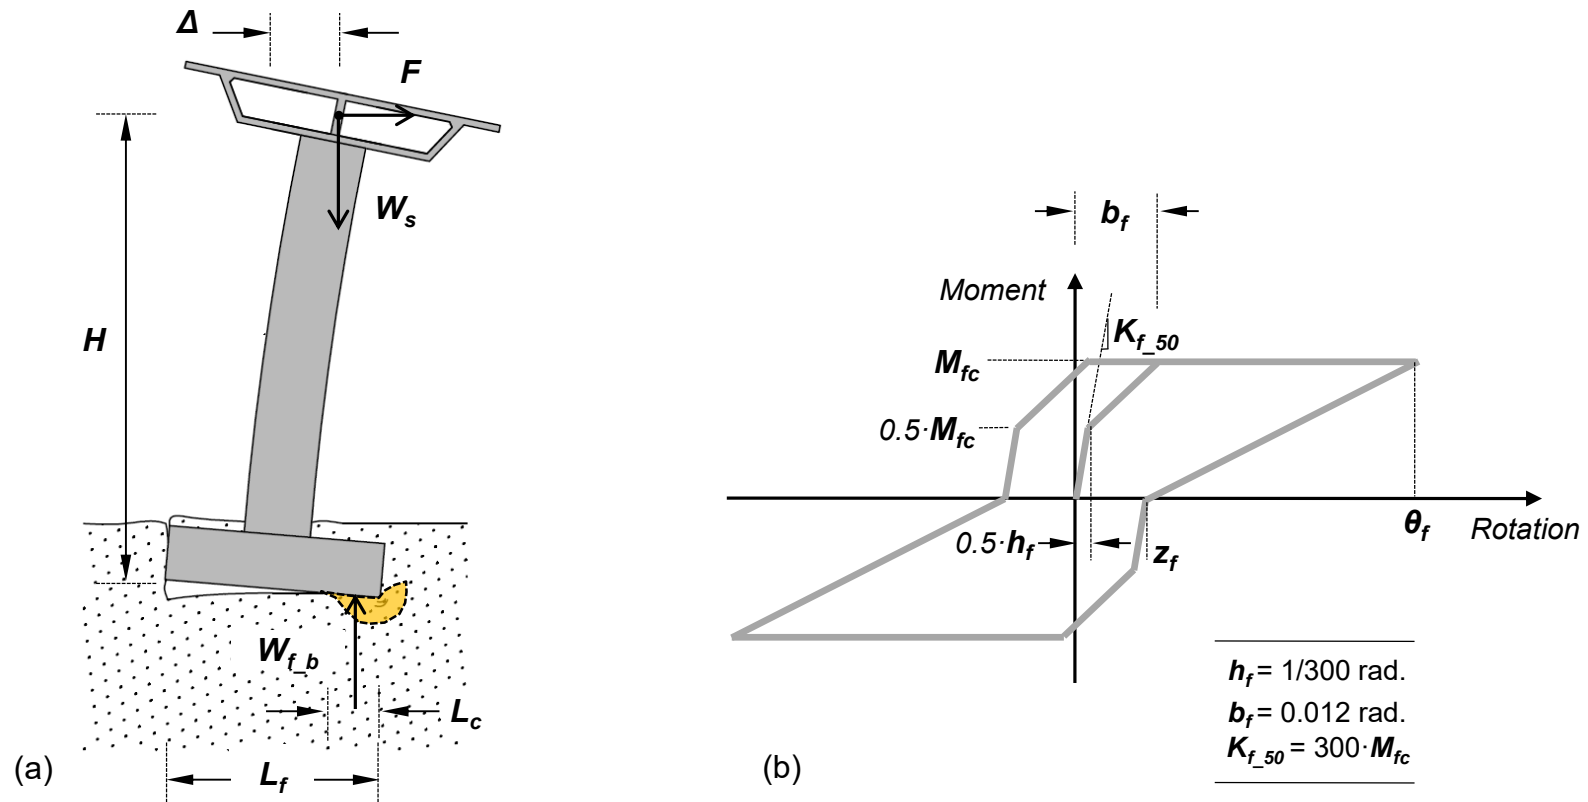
(a) Schematic of a flexible elastic cantilever bridge column on a rocking shallow foundation; and (b) Deng et al. [2014] multilinear hysteretic model for rocking shallow foundations.
